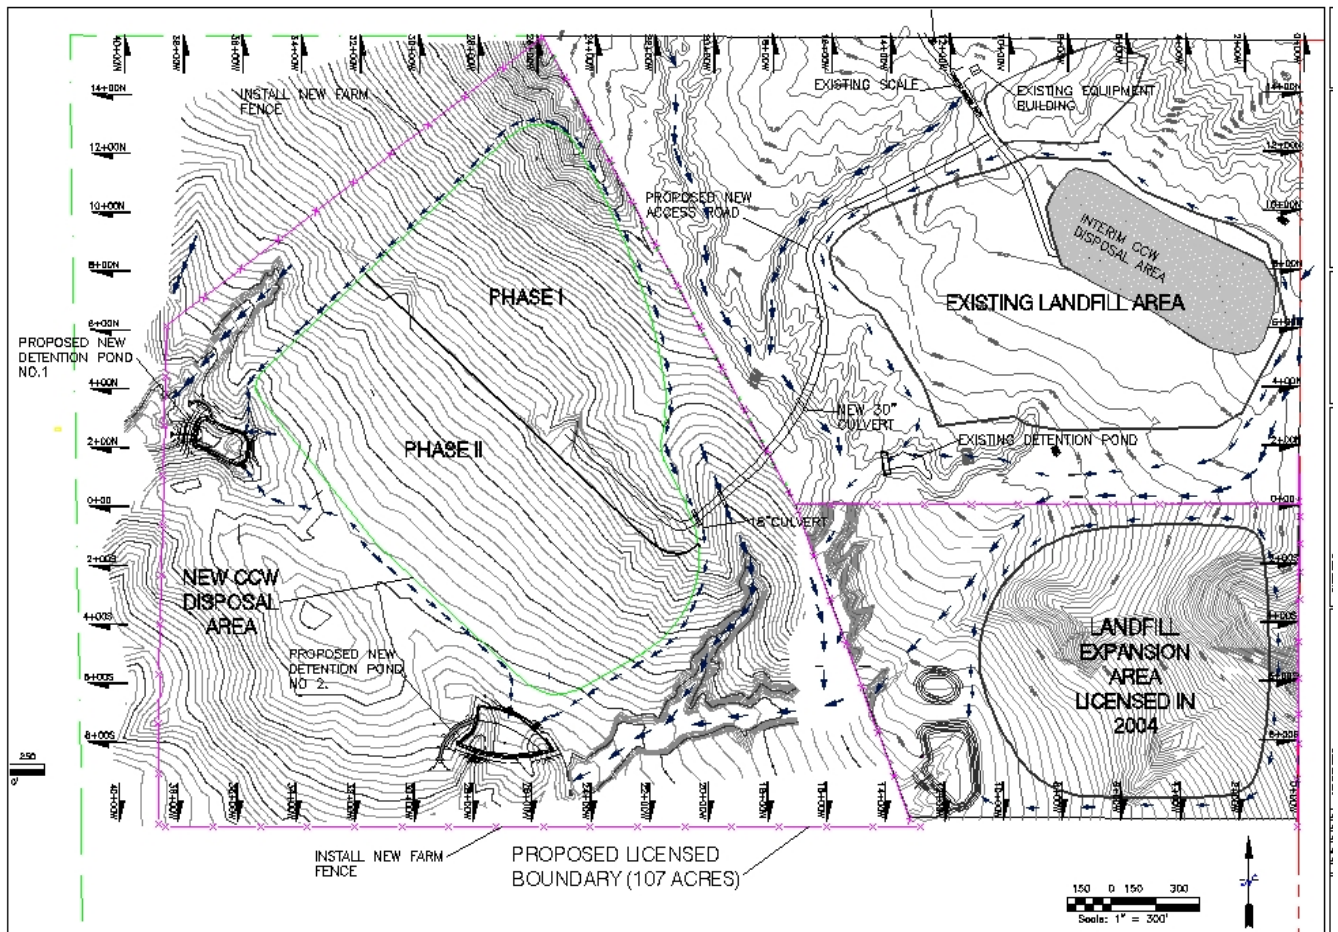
Plan view showing the design features and phased construction of the proposed ash disposal area. (Source: Hydrometrics, Inc., December 2007)
